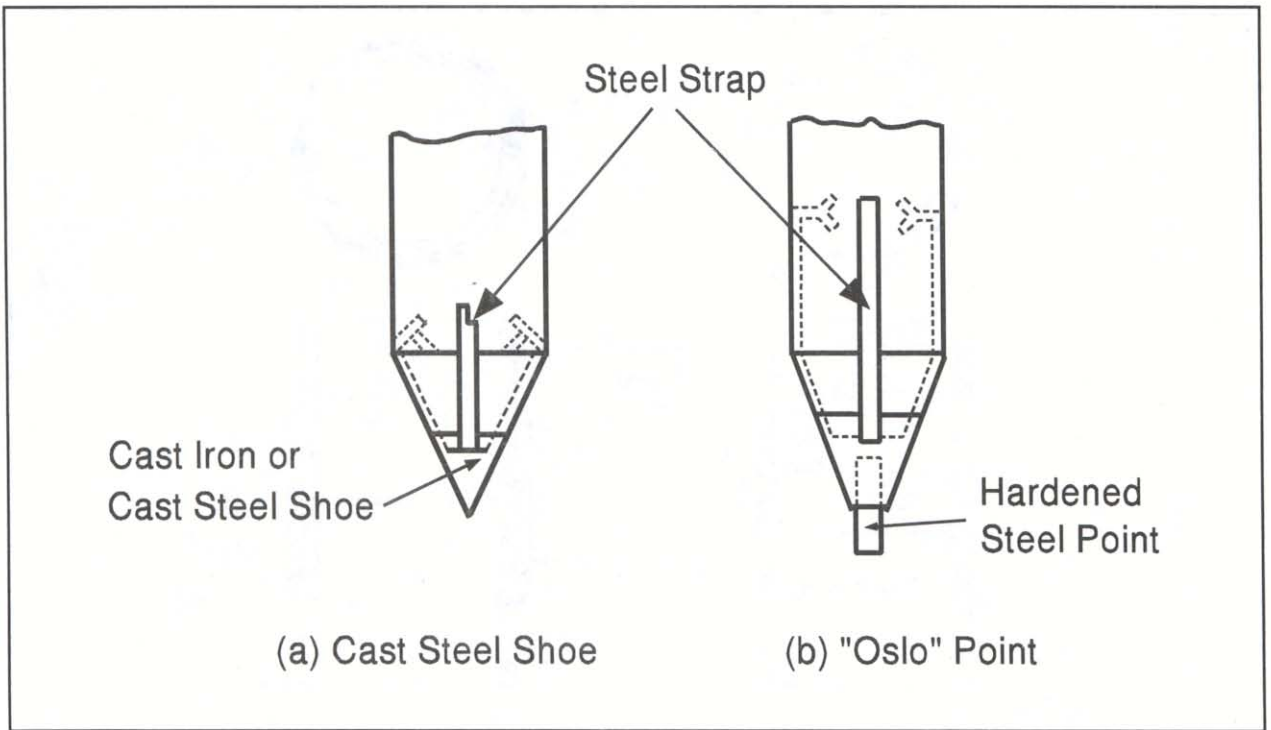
Pile Toe Attachments for Precast Concrete Piles
